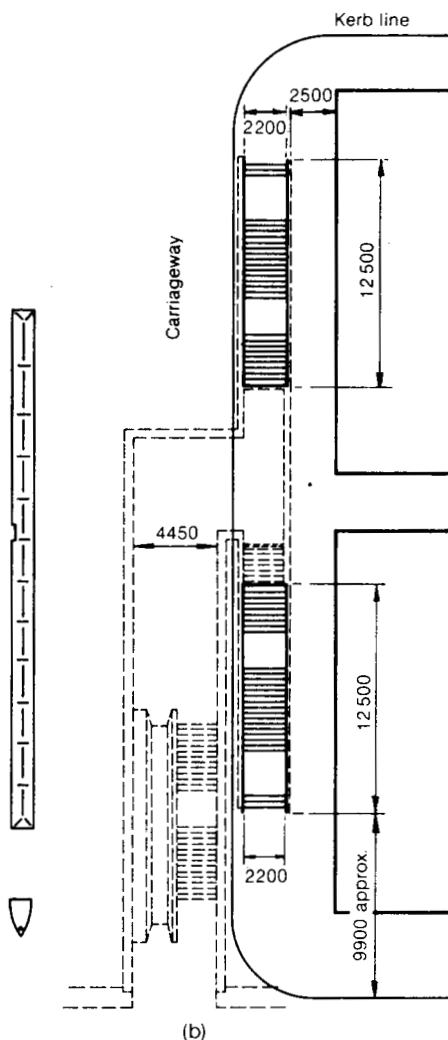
(above and right). Typical entrance layouts (dimensions in millimetres)
